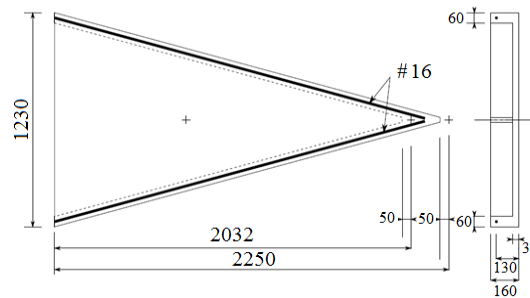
Top view of specimens (Left side) and cross-section (Right side) – Dimensions in mm
